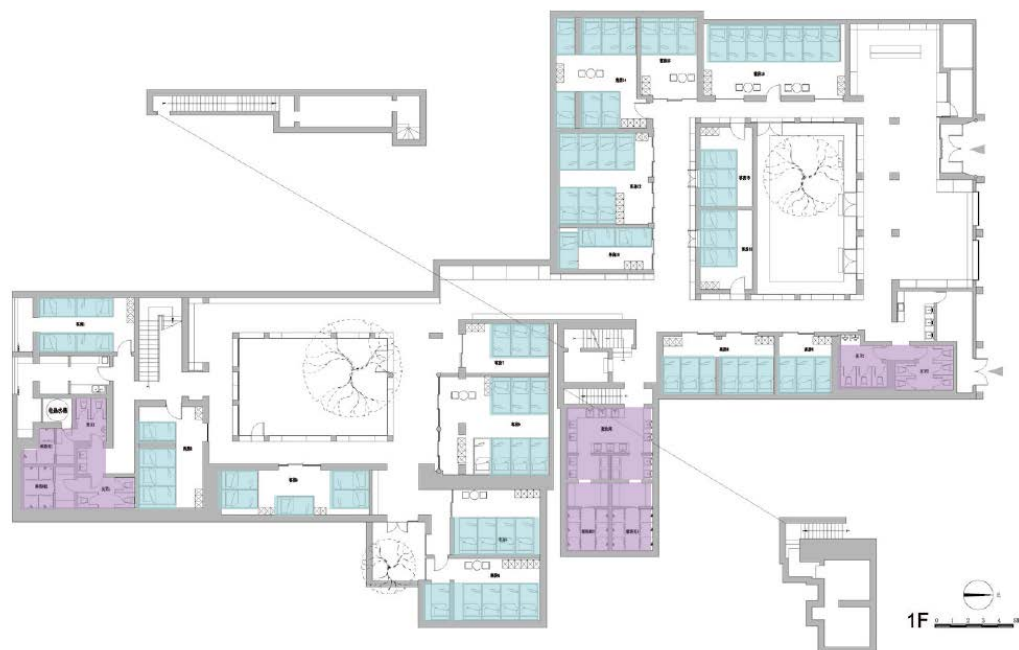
Illustration of floor plan of Xiezu Hutong Capsule Hotel, Beijing
